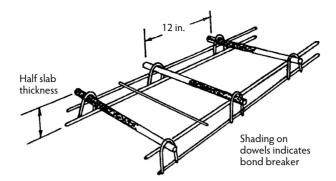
Example of a dowel bar assembly. (From ACI Committee 224, *Joints in Concrete Construction*, ACI 224.3R-95, American Concrete Institute, Farmington Hills, MI, 1995, pp. 1–44.)
